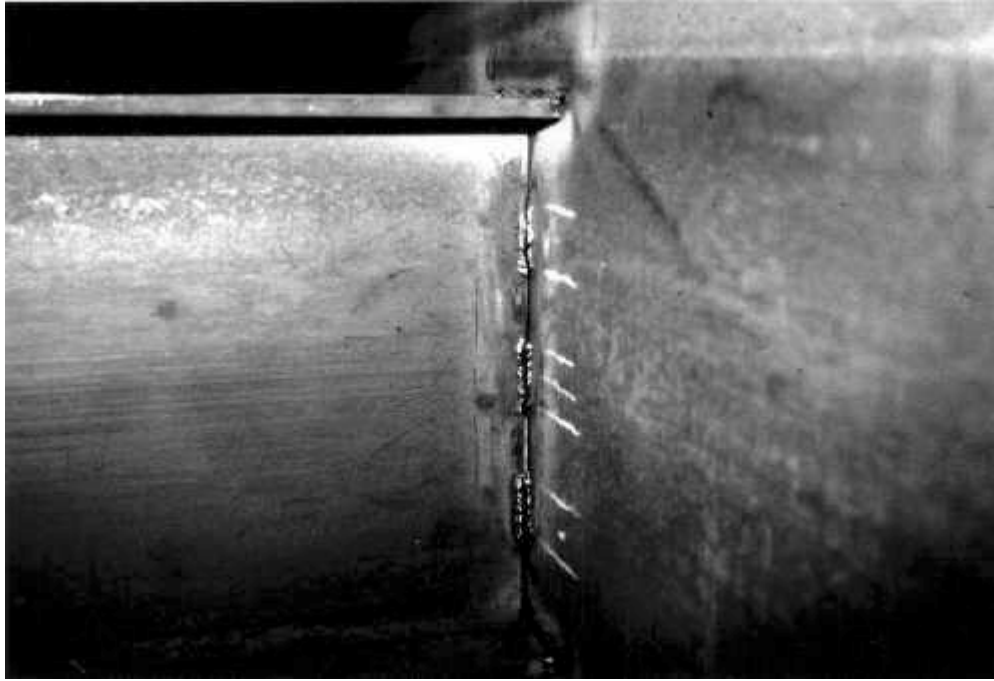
Typical fractured web welds in nonstaggered diaphragm tests
